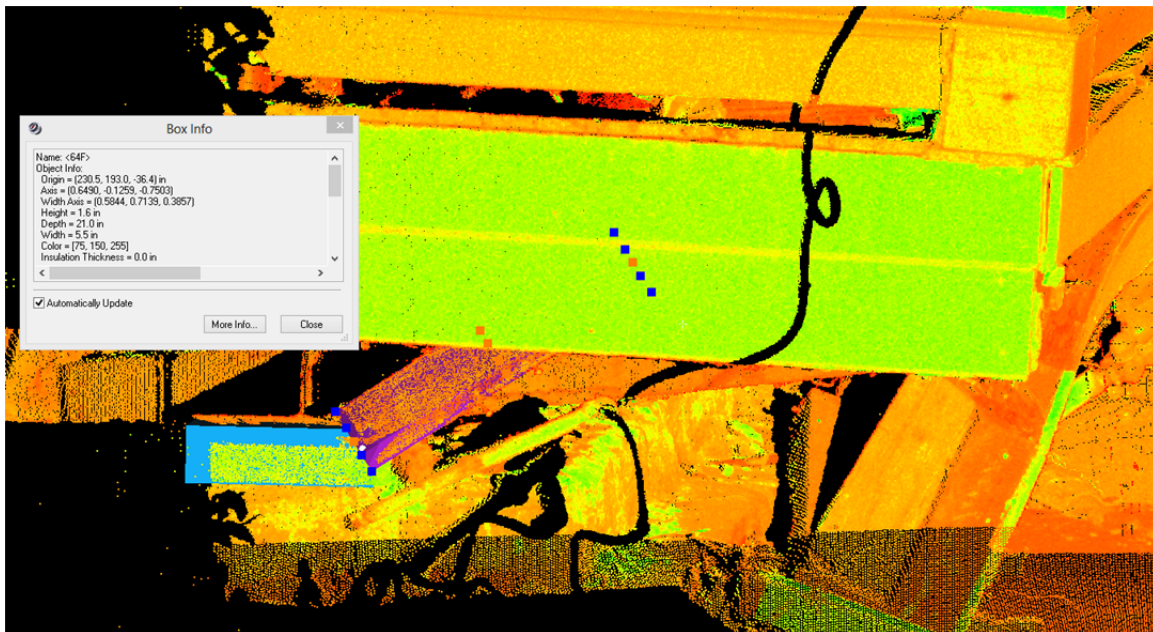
Supporting members of the building: blue – sill plate, pink – stud, most likely 2 in. × 6 in., and 21 in. long based on the point cloud.
